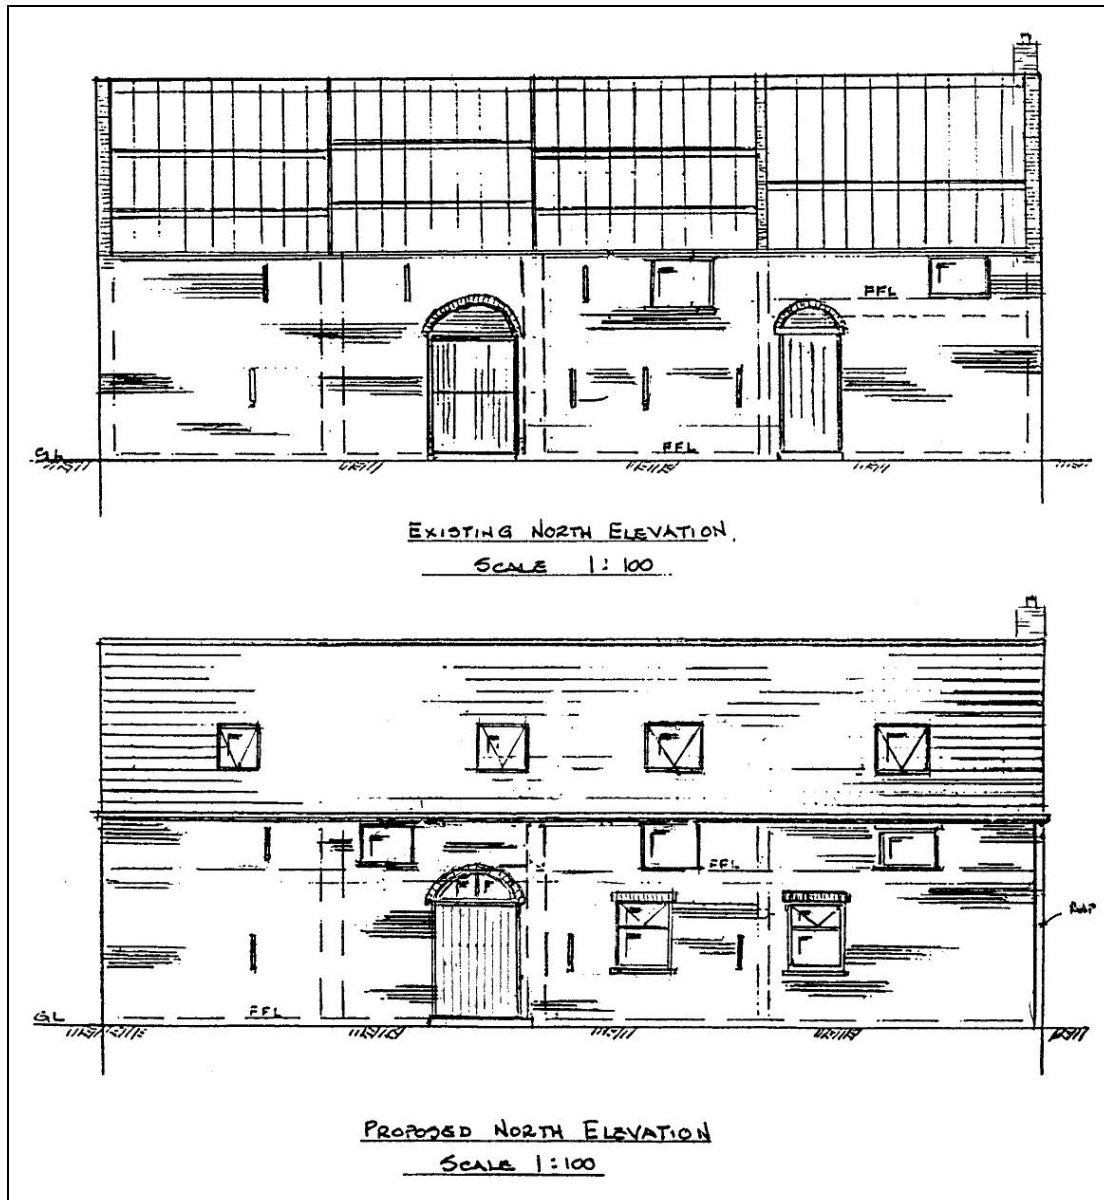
Plan of the existing & proposed north elevation (supplied by client)
